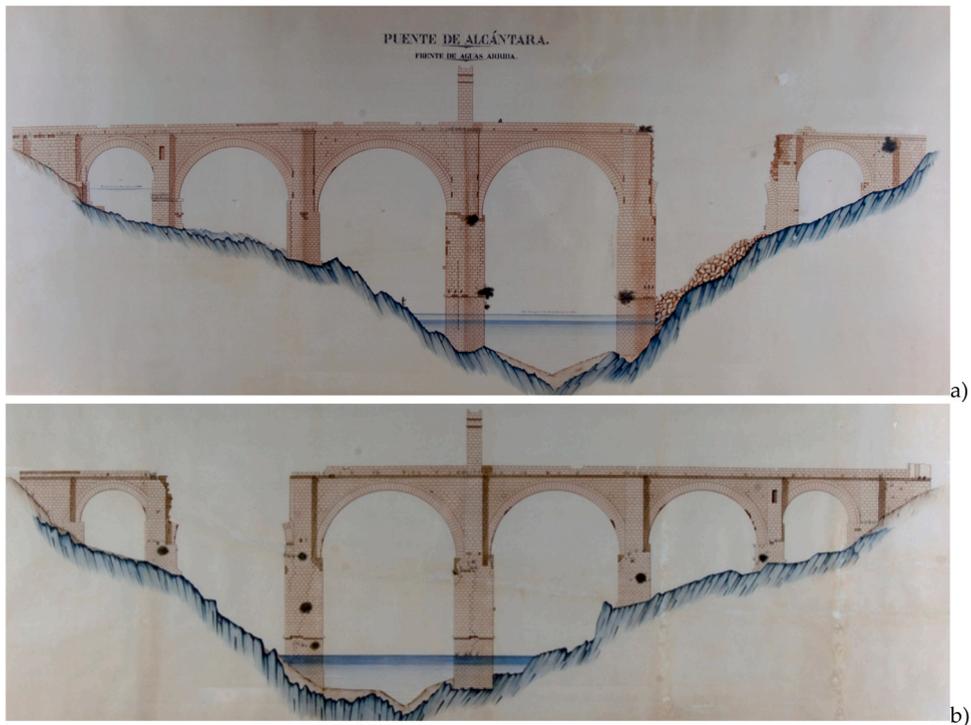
Plans of the upstream elevation, upper, and downstream elevation, lower, with the damage survey by Millán [40].
